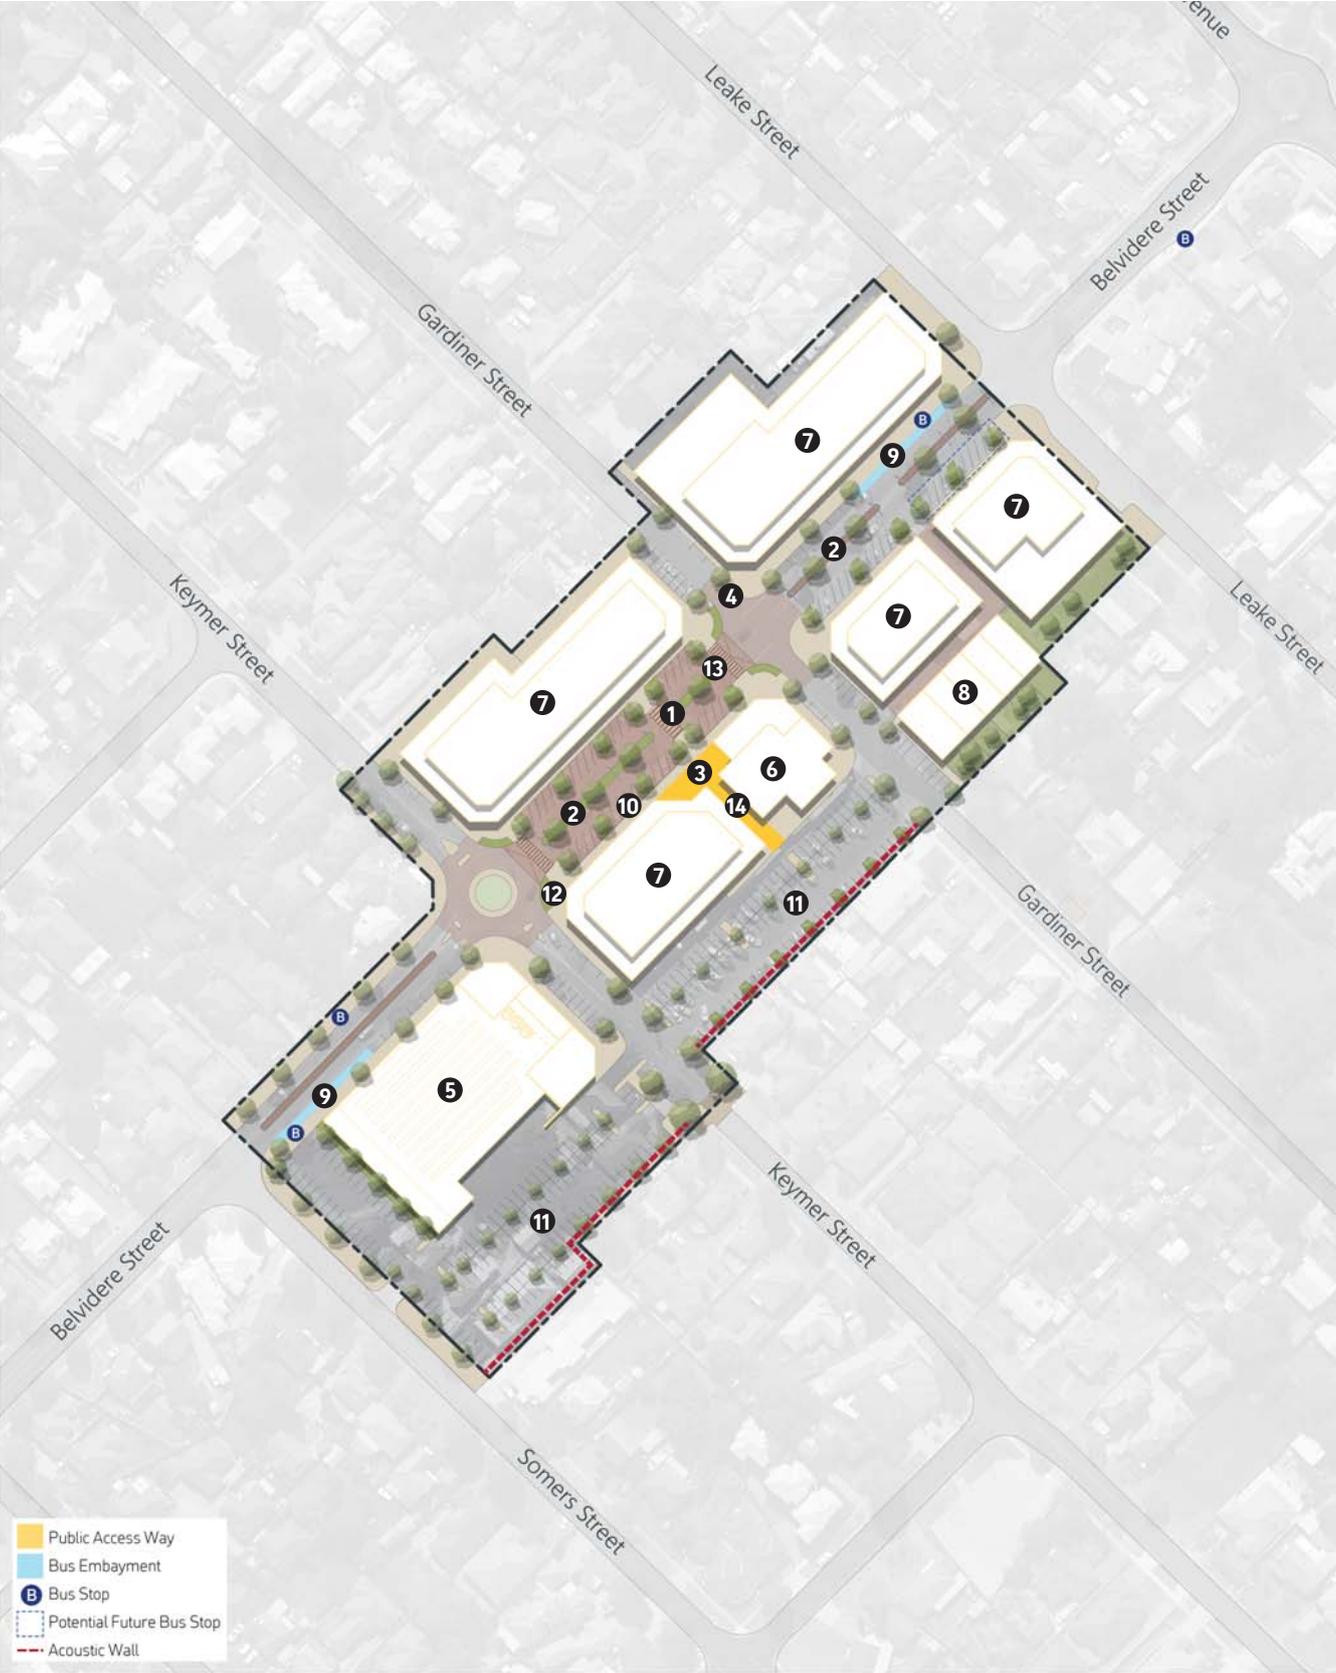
Belvidere Main Street Precinct - Proposed Master Plan
